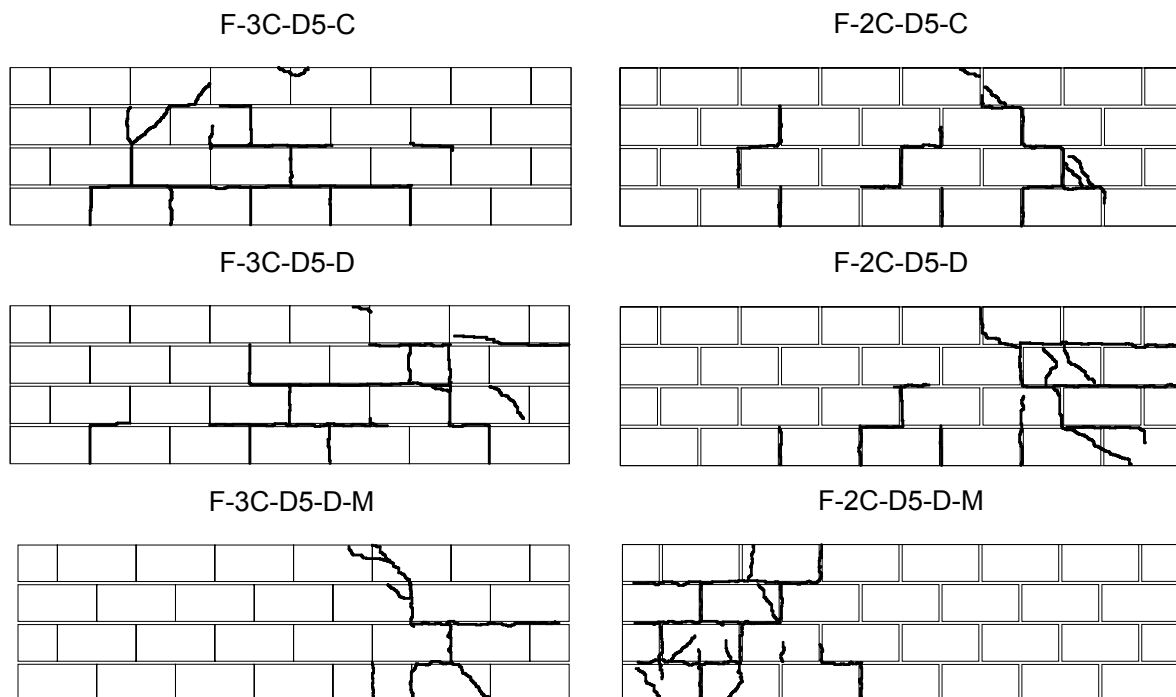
Cracking patterns in four point load tests of masonry beams which presented a shear or a mixed shear-flexure failure.
